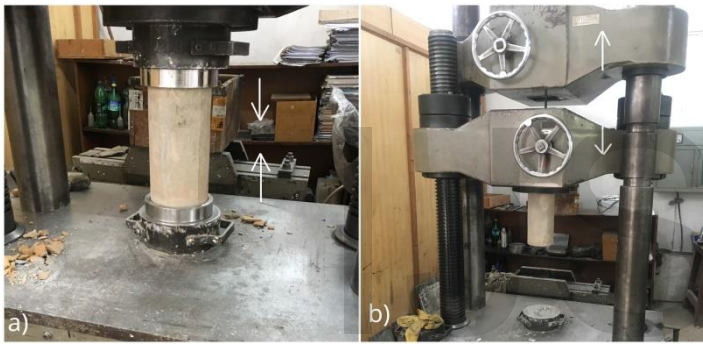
a) Compression test setup b) Pull-Out bond strength test setup.
